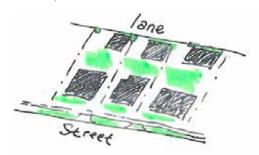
Example of primary building oriented to the street and laneway units in the back with greenspace in the middle of the lot, fitting into the existing pattern.
